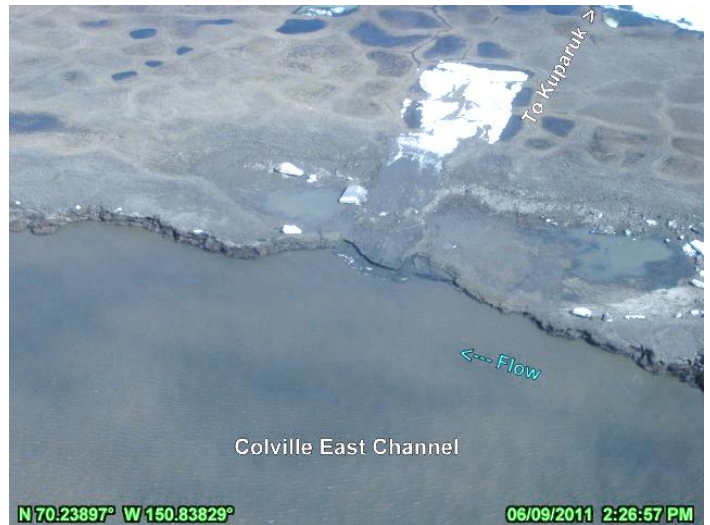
COLVILLE RIVER ICE BRIDGE EAST SIDE POST-BREAKUP, LOOKING EAST; JUNE 9, 2011
